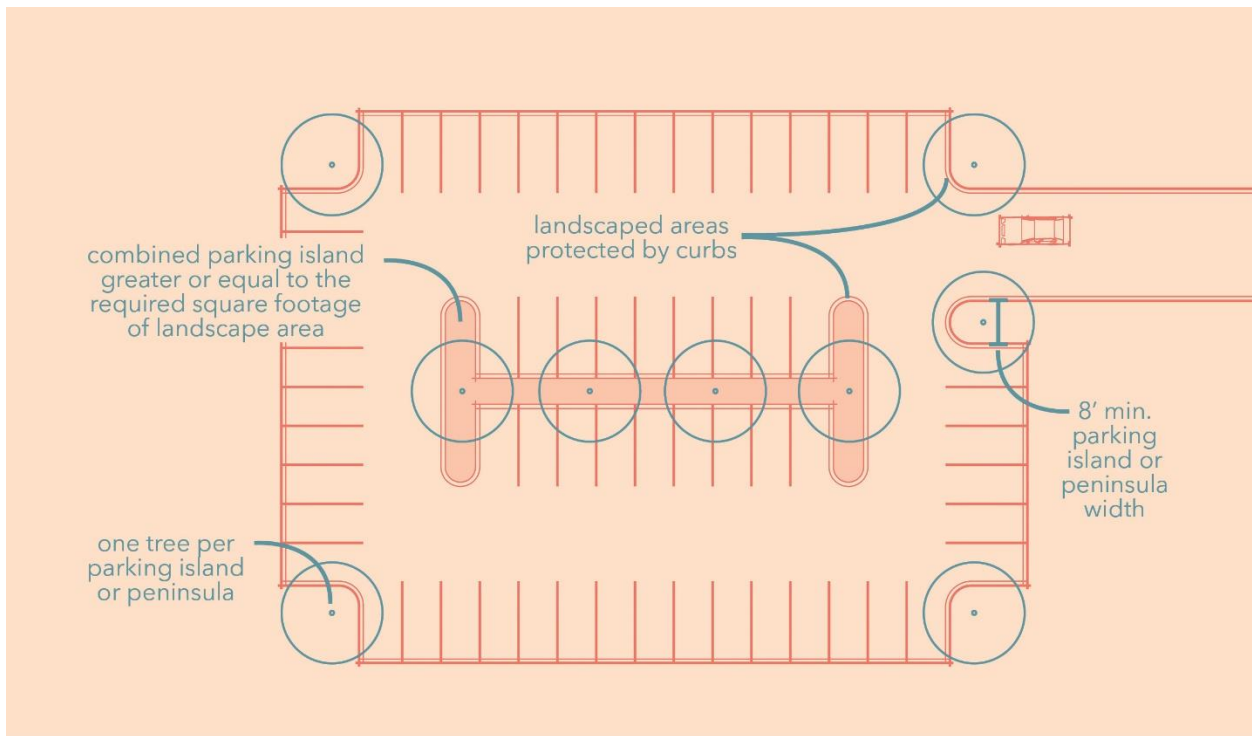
PARKING LOT INTERIOR LANDSCAPING
